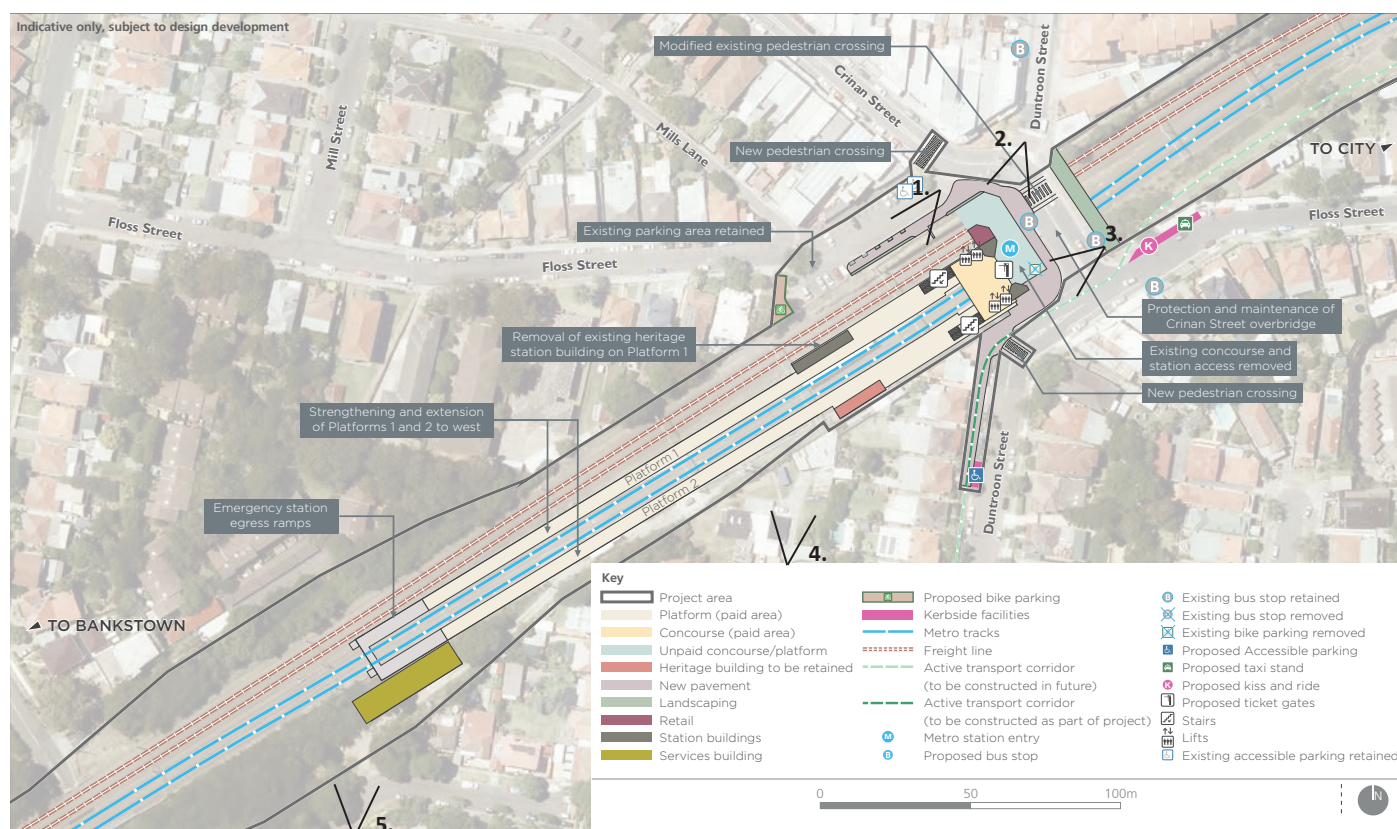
VIEWPOINT LOCATION PLAN
